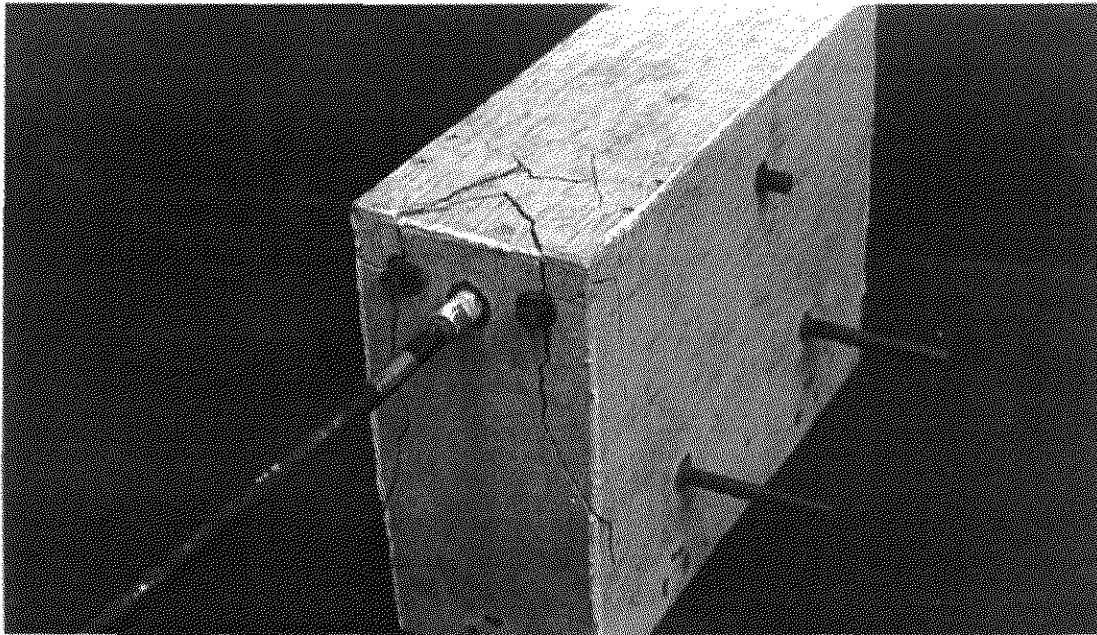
Beam-end test specimen with transverse stirrups after failure
